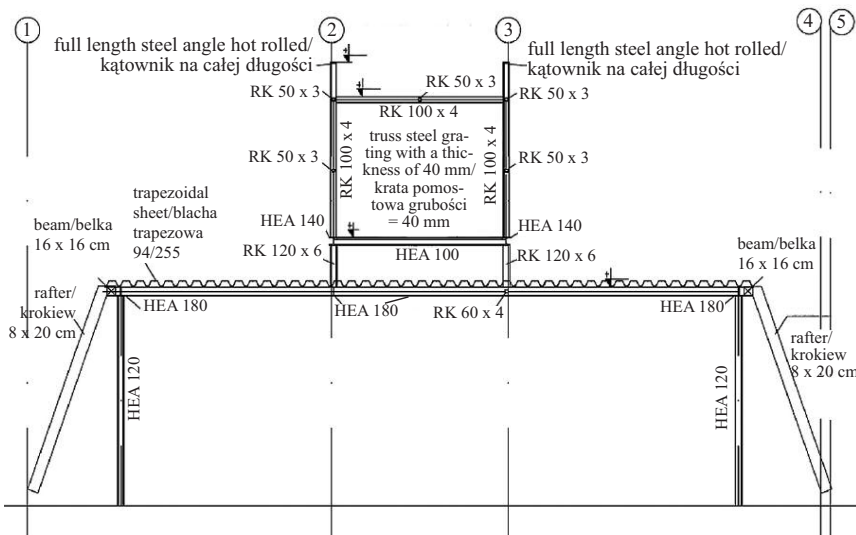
New steel roof structure replacing the previous timber mansard roof
